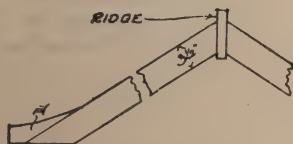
Enlarged Details of Construction of Roof of Porch
